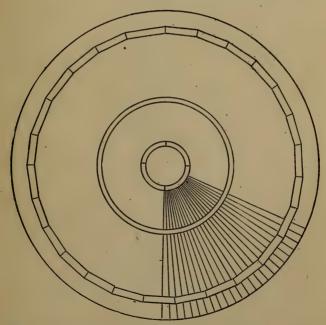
Showing construction of conical roof of round silo, where rafters are not used. The outer_circle is the lower edge of the roof.
